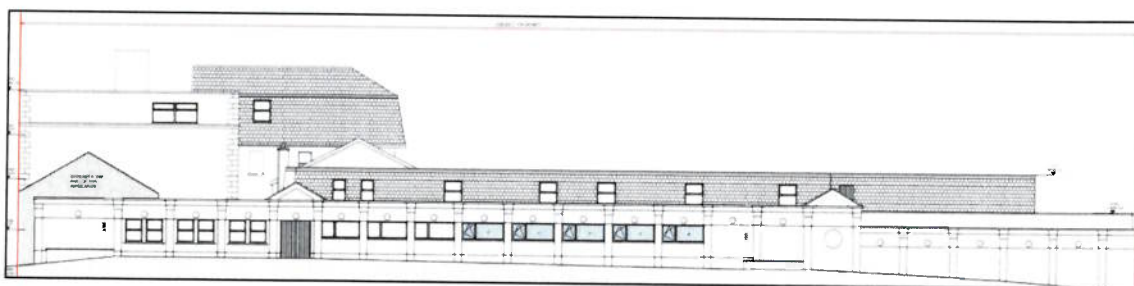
Southwest elevation with 5 no. proposed windows, as submitted at Application Stage.
